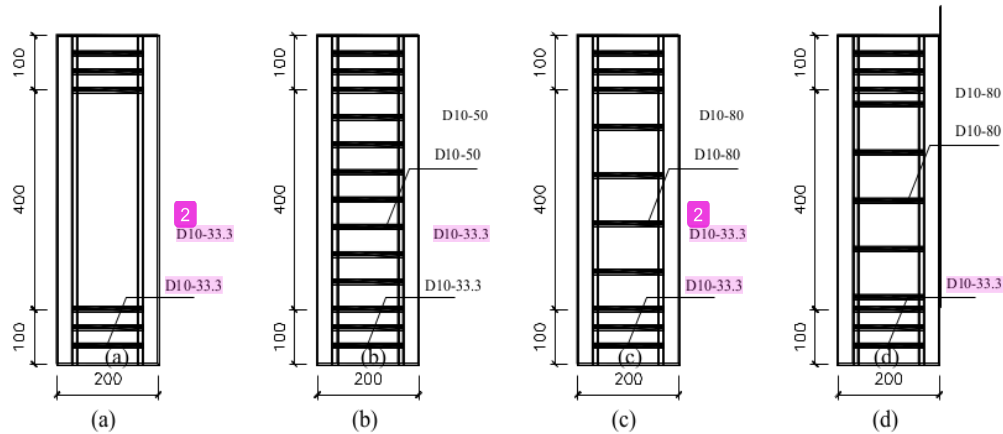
Longitudinal sections of internal confinement arrangements of specimens: (a) CS01, S04, S04c, S04d, S04e, S04f; (b) CS03a; (c) S04a; (d) S04f
